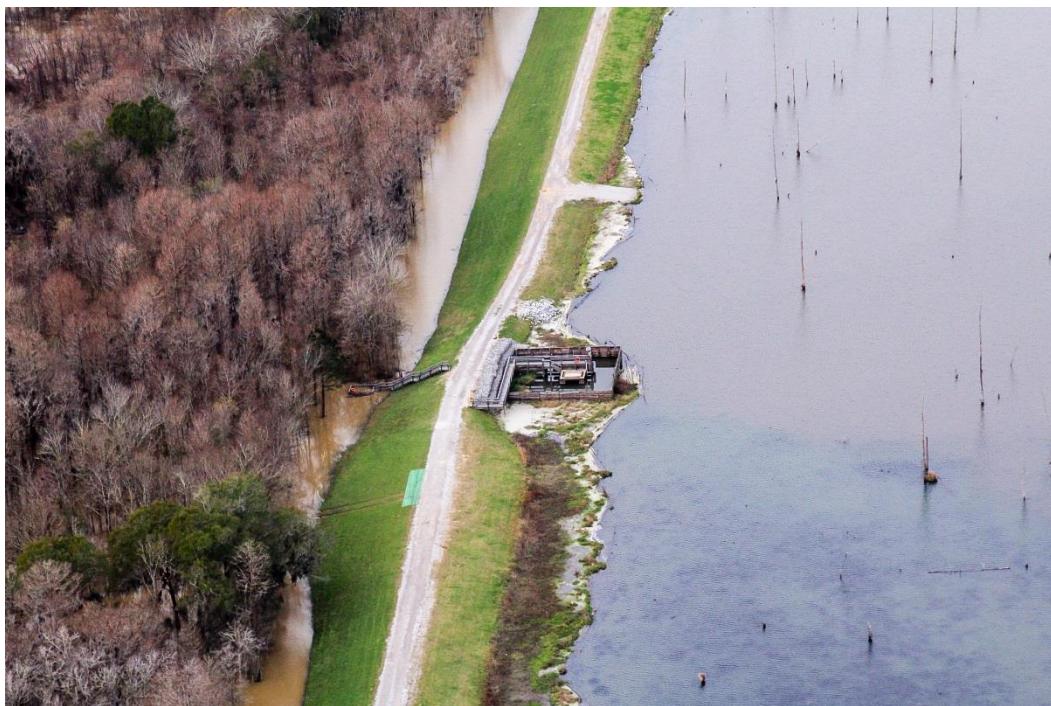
Evidence of Piping North of Pond Outlet (Feb. 4, 2016)
